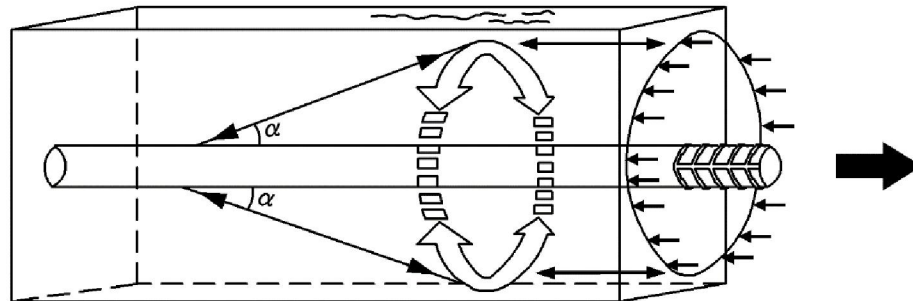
Schematic of internal forces within reinforcement concrete specimen (Tepfers, 1979).
